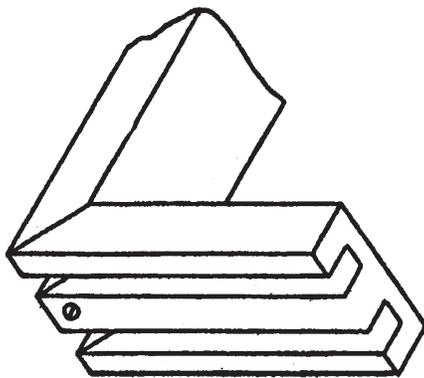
JOINT OF CASING ON THE EXTERNAL SIDES OF WALLS
